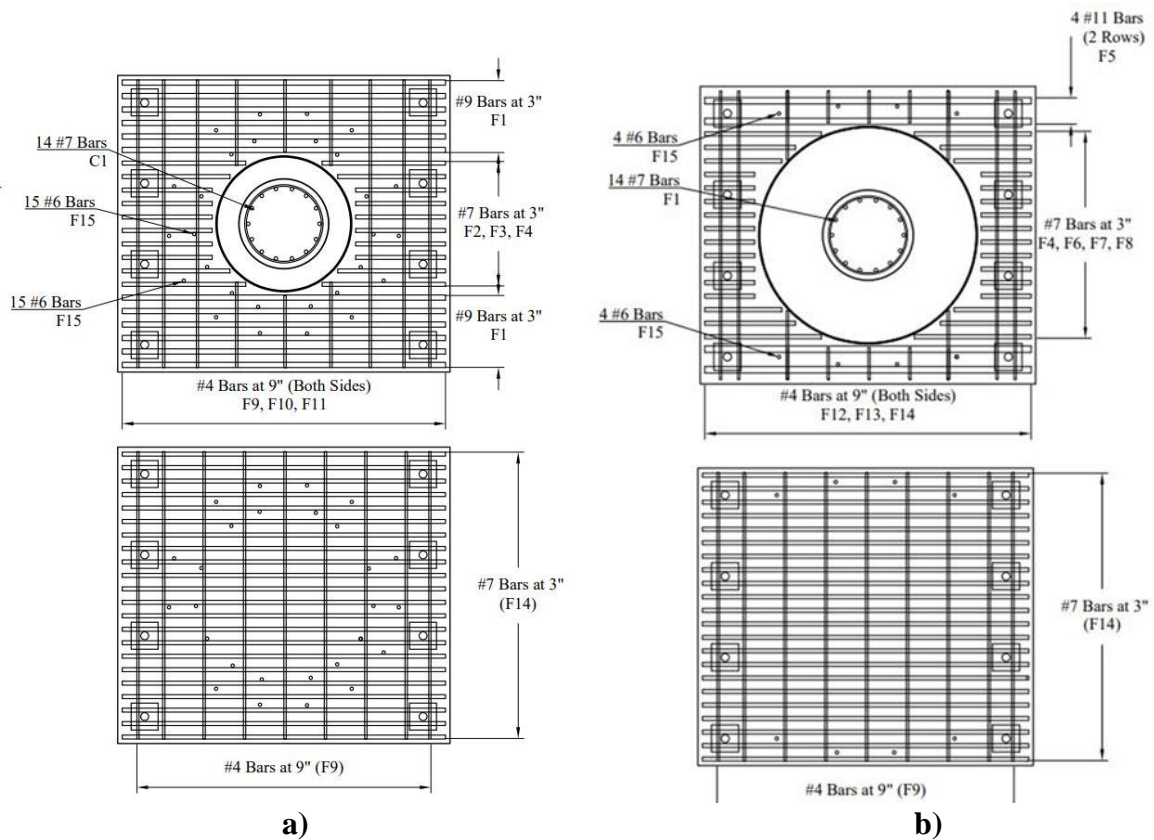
Transfer Block Reinforcement a) Specimens 30-21, 30-21-R, and 30-21-LD and b) Specimen 48-21
